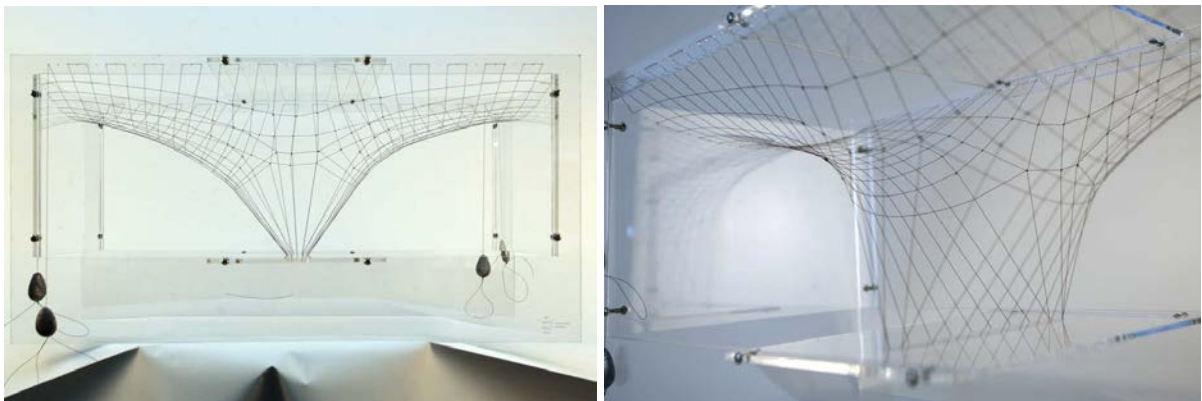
Model of the extended Waal Bridge : The initial construction proposed a formwork of cable nets supporting fabric membrane to contain concrete for this project. Unfortunately this was not followed through and timber ply shuttering were used instead to create the bridge. (copyright: ZJA, Amsterdam)
